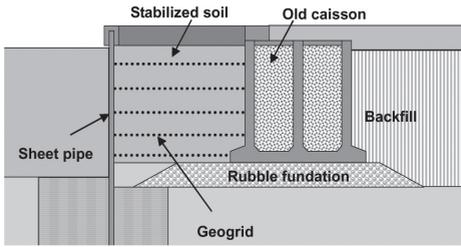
The SG-wall method for renewal case for old caisson quay wall.
